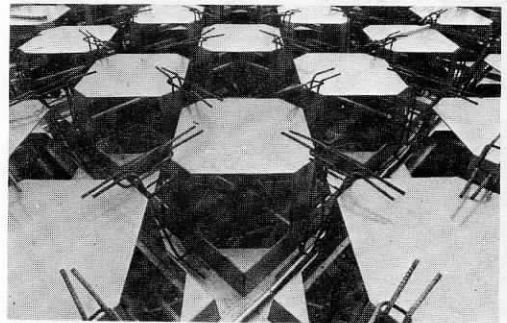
Shoring, Formwork, Reinforcing and Posttensioning
